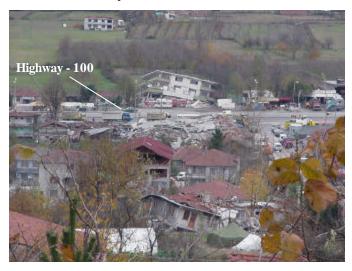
Heavily damaged central section of Kaynasli, (source: USC-GEES)
